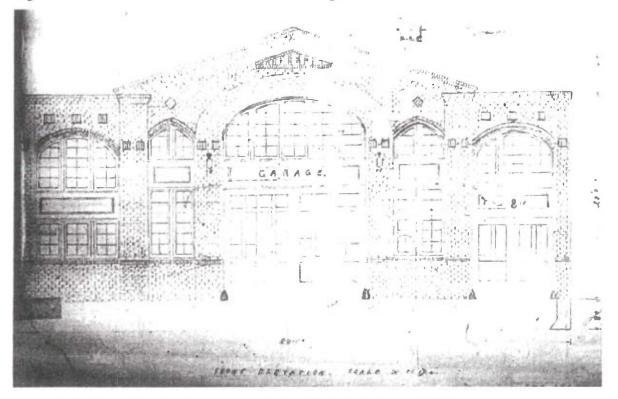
Original elevation drawing of the subject building. Source: SF DBI.
